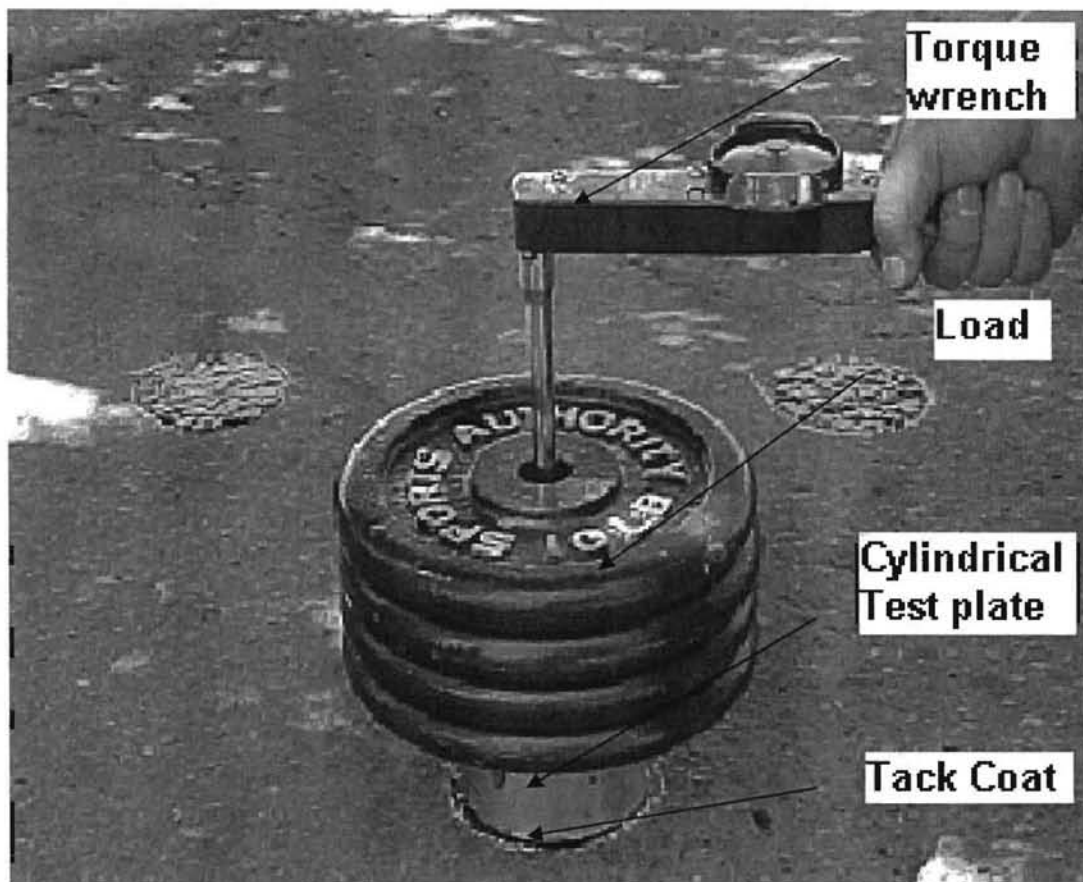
UTEP Torque Test Field Test Set-Up
